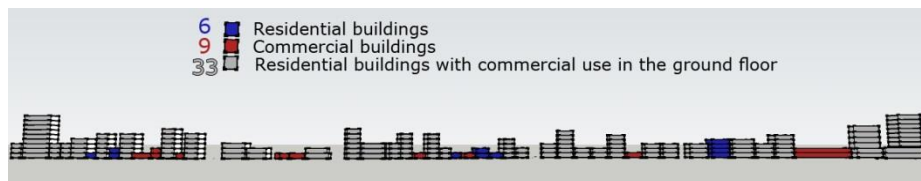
Three categories of Buildings Have Spread in the Salamis Street Encompassing: Residential Buildings, Commercial Buildings and Residential Buildings Together with Commercial Use at the Ground Floor (Illustration drawn by author)
